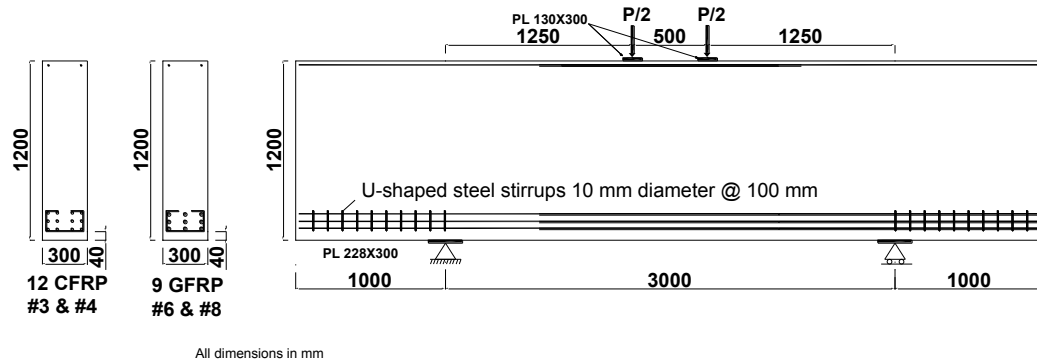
Dimensions of beam sections and details of reinforcement configuration.
